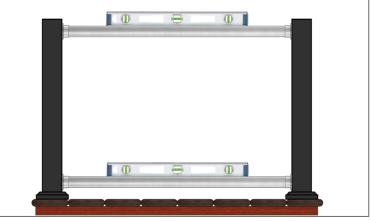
Figure H. With one sidemount installed, slide the other fitting against the opposite post. Slide it up or down until level
